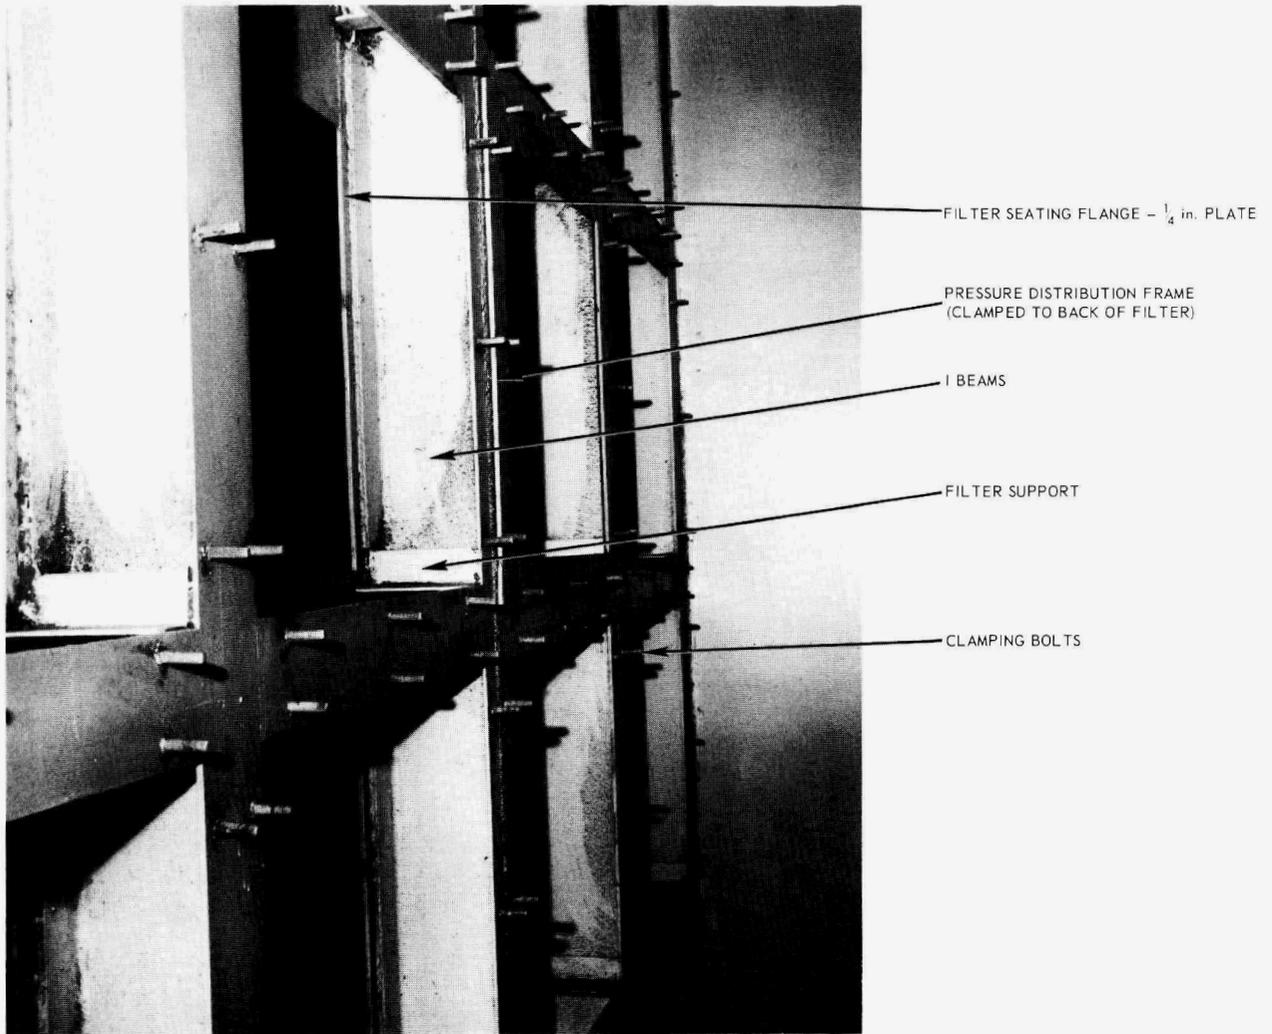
Built-up pocket-type filter mounting frame for 500-cfm HEPA filters. Courtesy Mound Laboratory.
